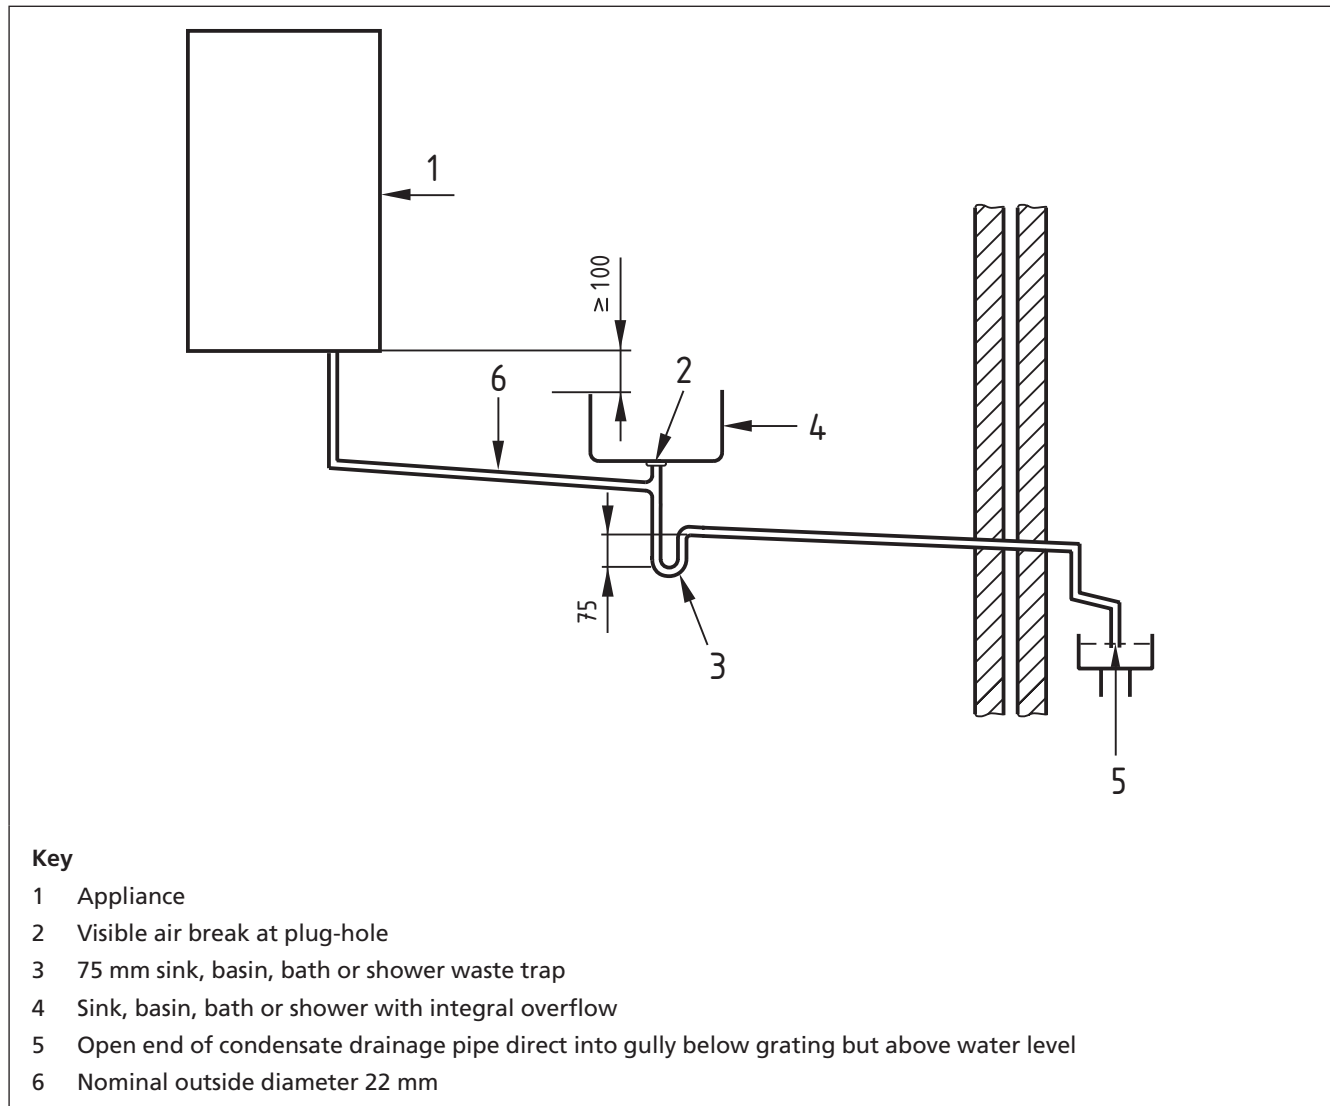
Connection of a condensate drainage pipe upstream of a sink, basin, bath or shower waste trap
